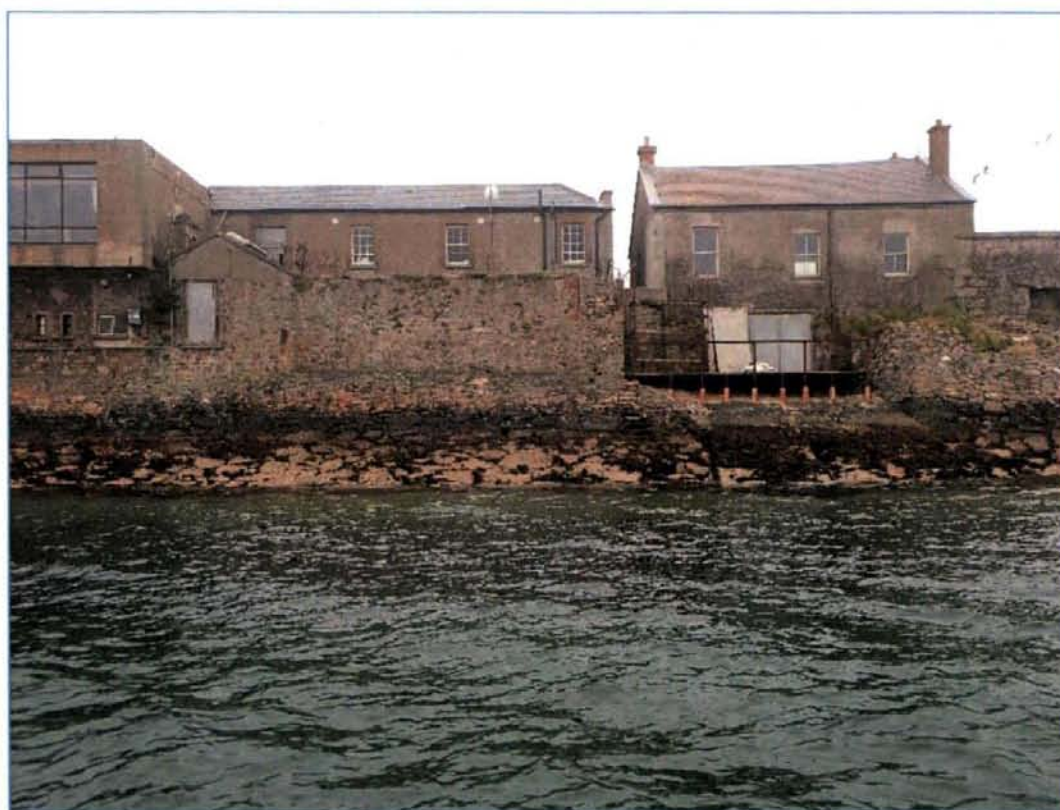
Sea view looking at the rear of the Clubhouse and adjacent building, highlighting the stone steps and slipway feature built across the glacis.
